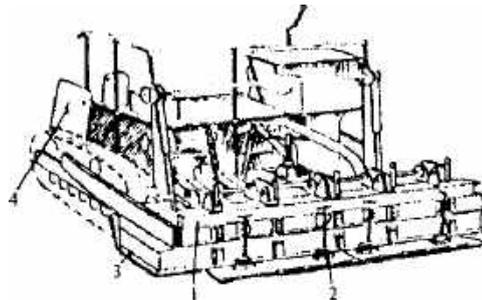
Road-metal spreading machine (macadam spreader, stone spreader) Рис. 2. Укладчик армированного дорожного покрытия (укладчик макадама)
